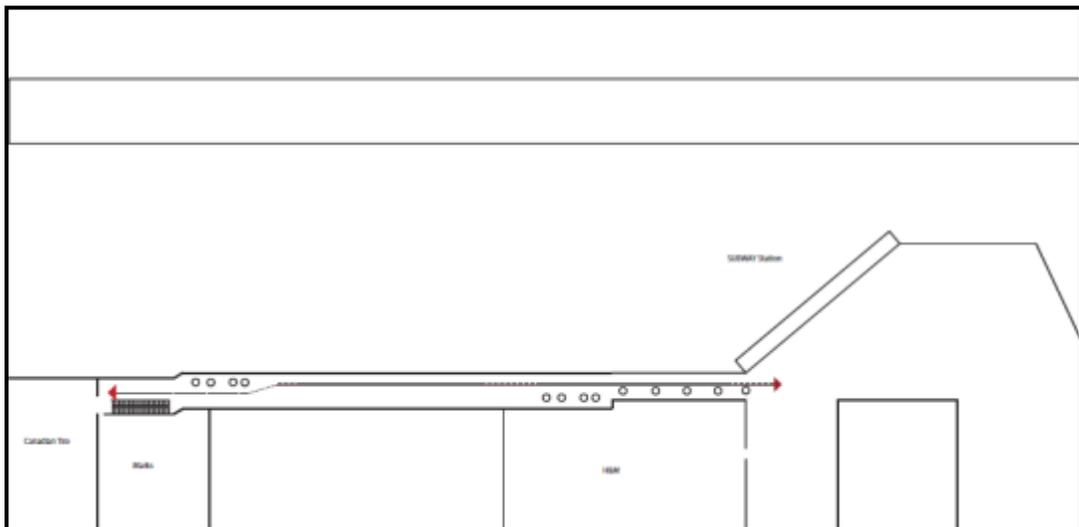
Current Plan of Eaton Center Underground Pathway Site
